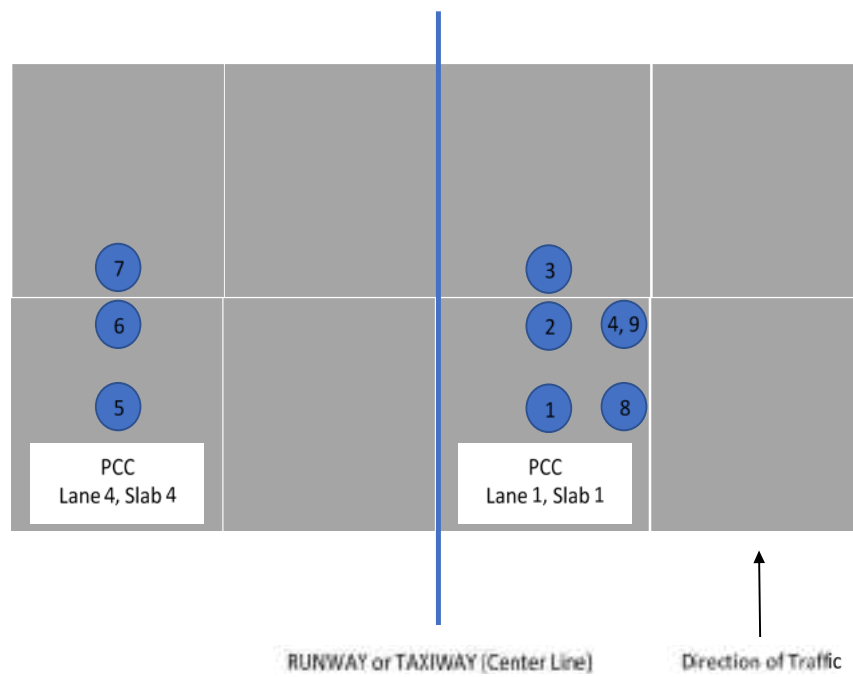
Testing Points Layout for PCC Runway or Taxiway with Centerline at Slab Joint (Offset Right)
